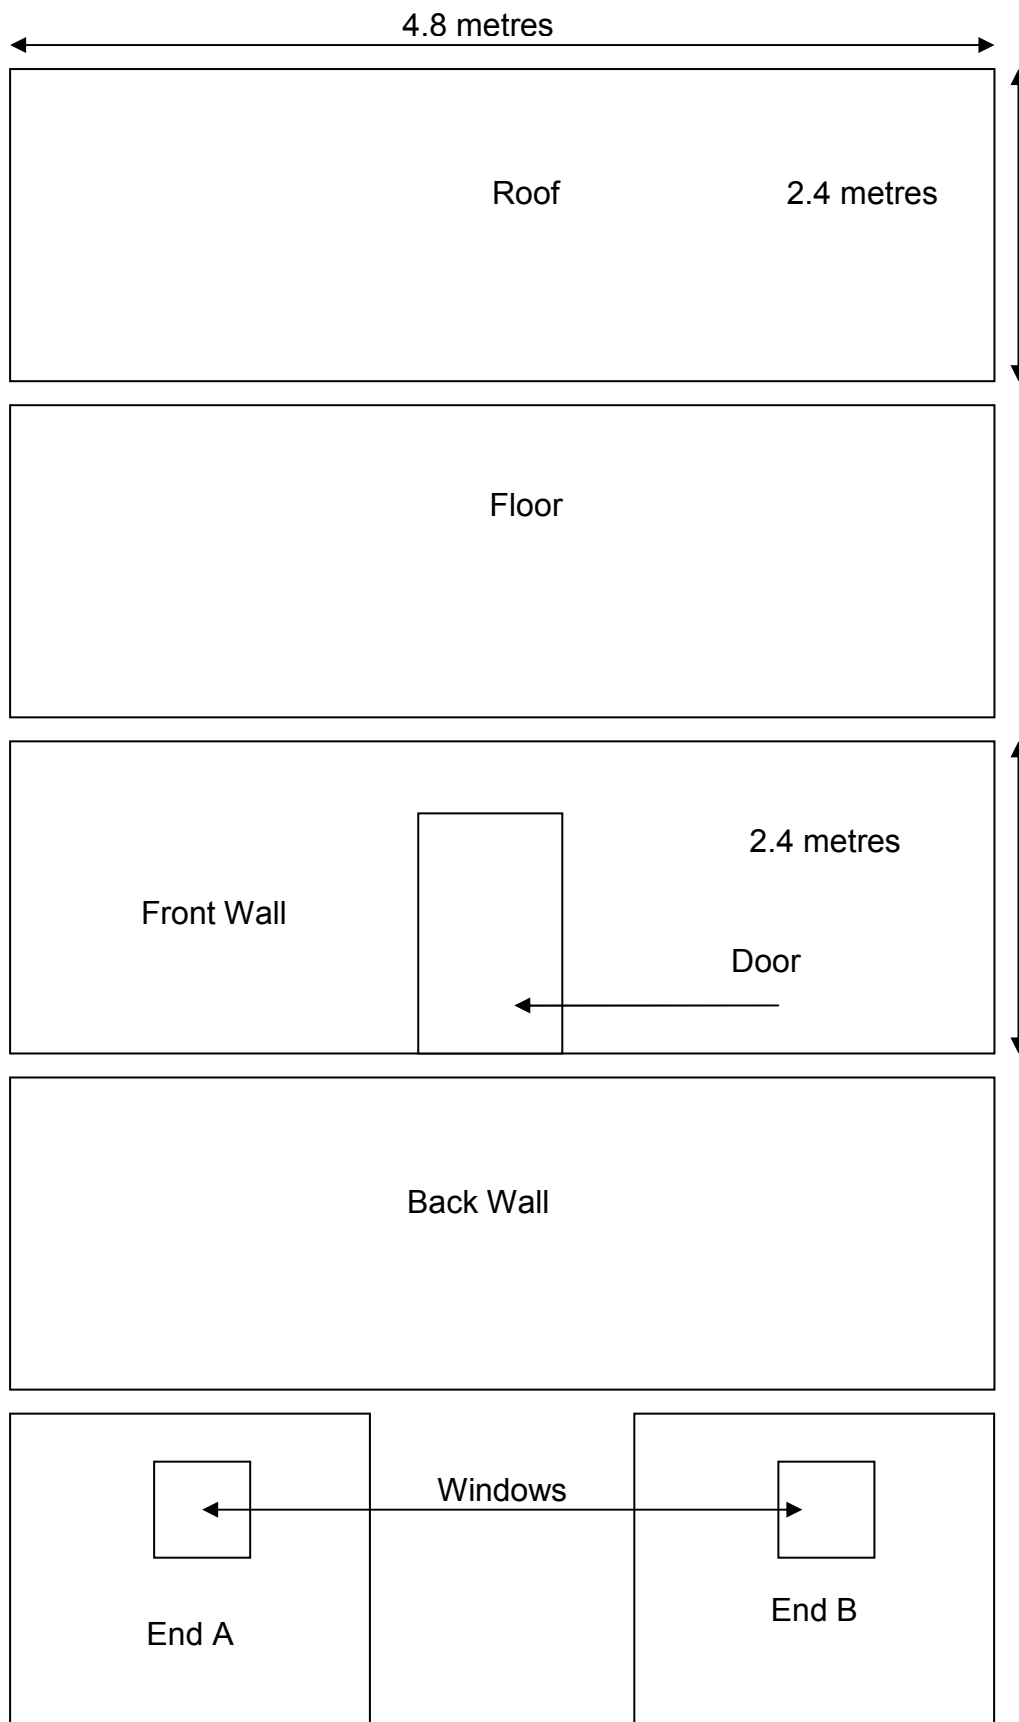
Shows the roof, floor, side and end elevations of the structure.
